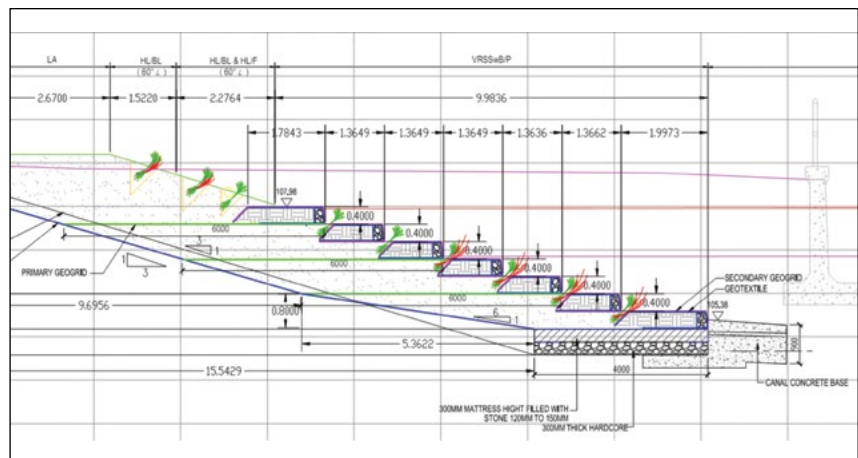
Typical cross-section of a geogrid-reinforced, soil bio-engineered slope.
